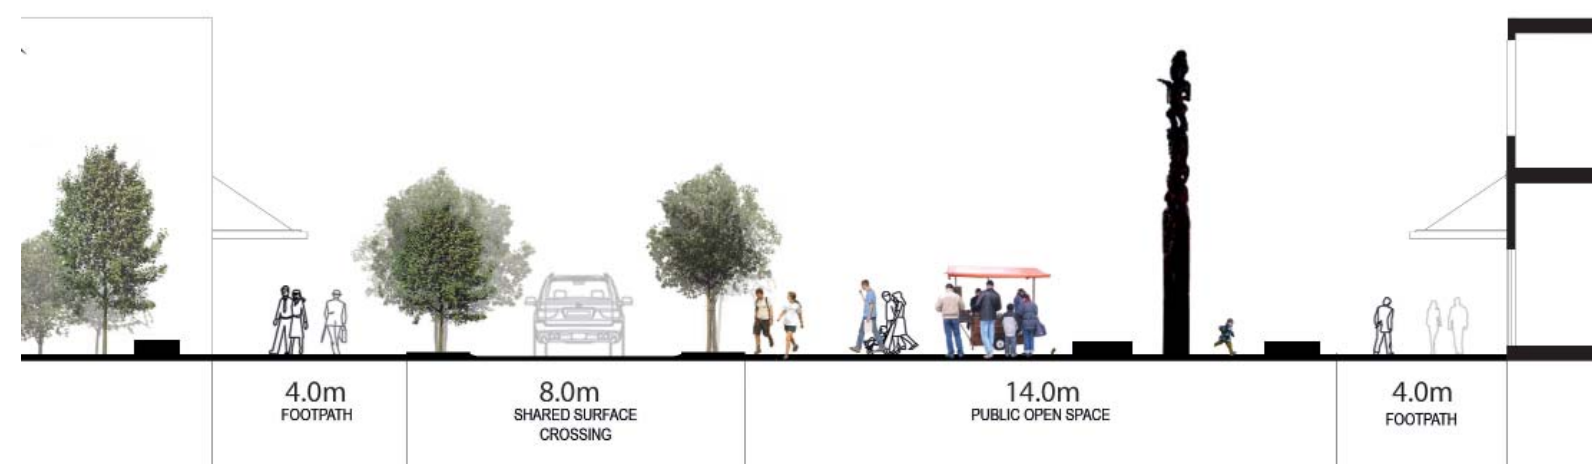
Indicative cross section - corner Jesmond Street and Great South Road - narrowing to one lane and provision of outdoor open space outside the library and southern side of the street
